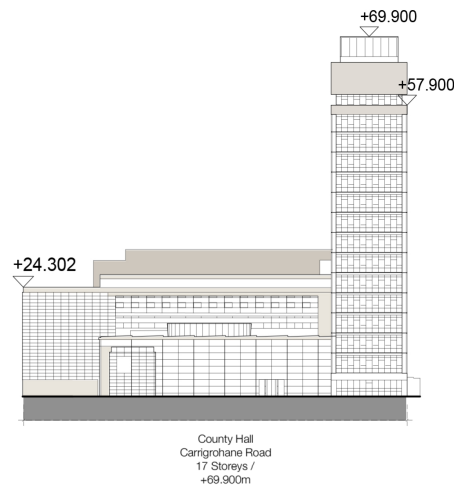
Building Height Study Drawing by Butler Cammoranes Architects
